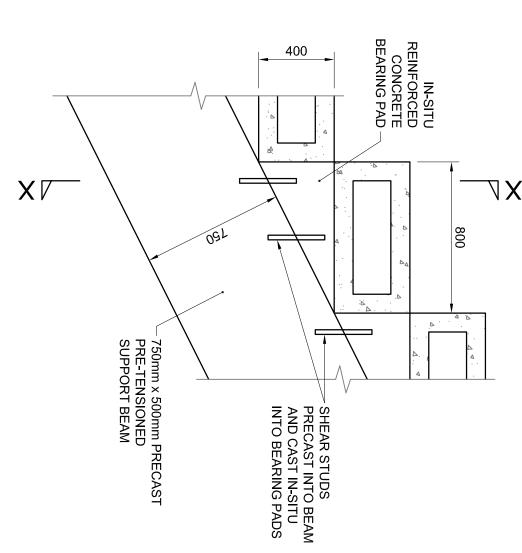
DETAIL a) JUNCTION BETWEEN ROOF BEAM AND SUPPORTING STRUCTURE 1:20
